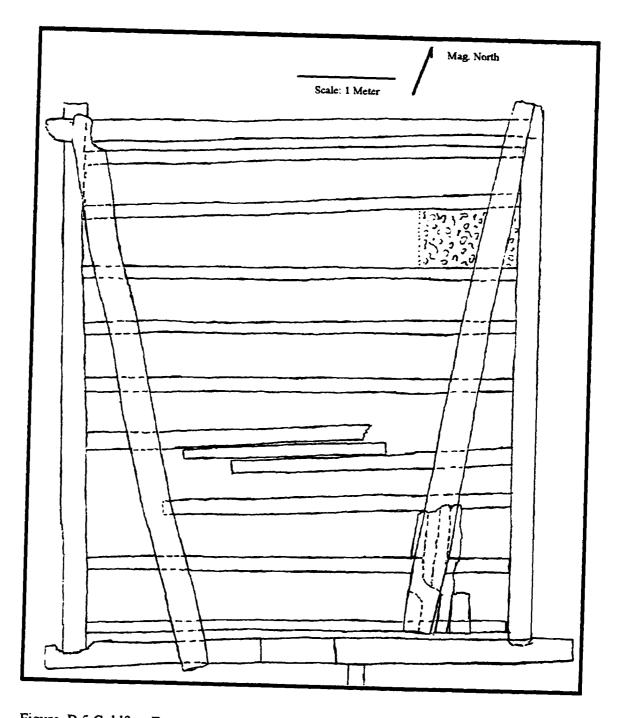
Coldfoot Feature 7, excavated foundation's remaining structural elements.
